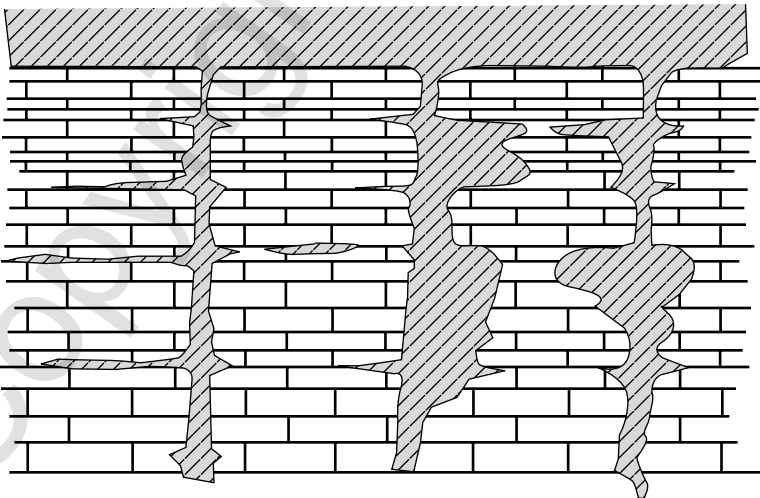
Condition of limestone at the site of the Bill Emerson Bridge, Missouri (from Miller, 2003).
